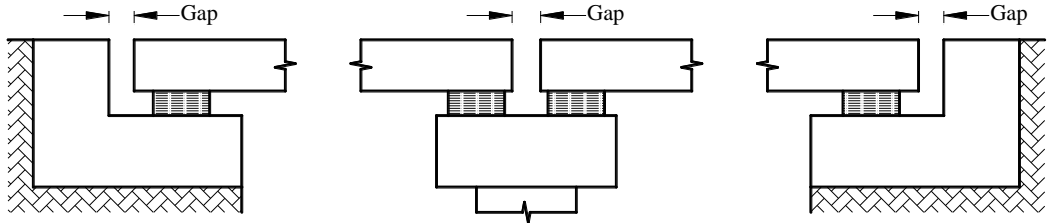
Sketch of two-span highway bridge supported on bearings at middle pier and abutments without pounding.
